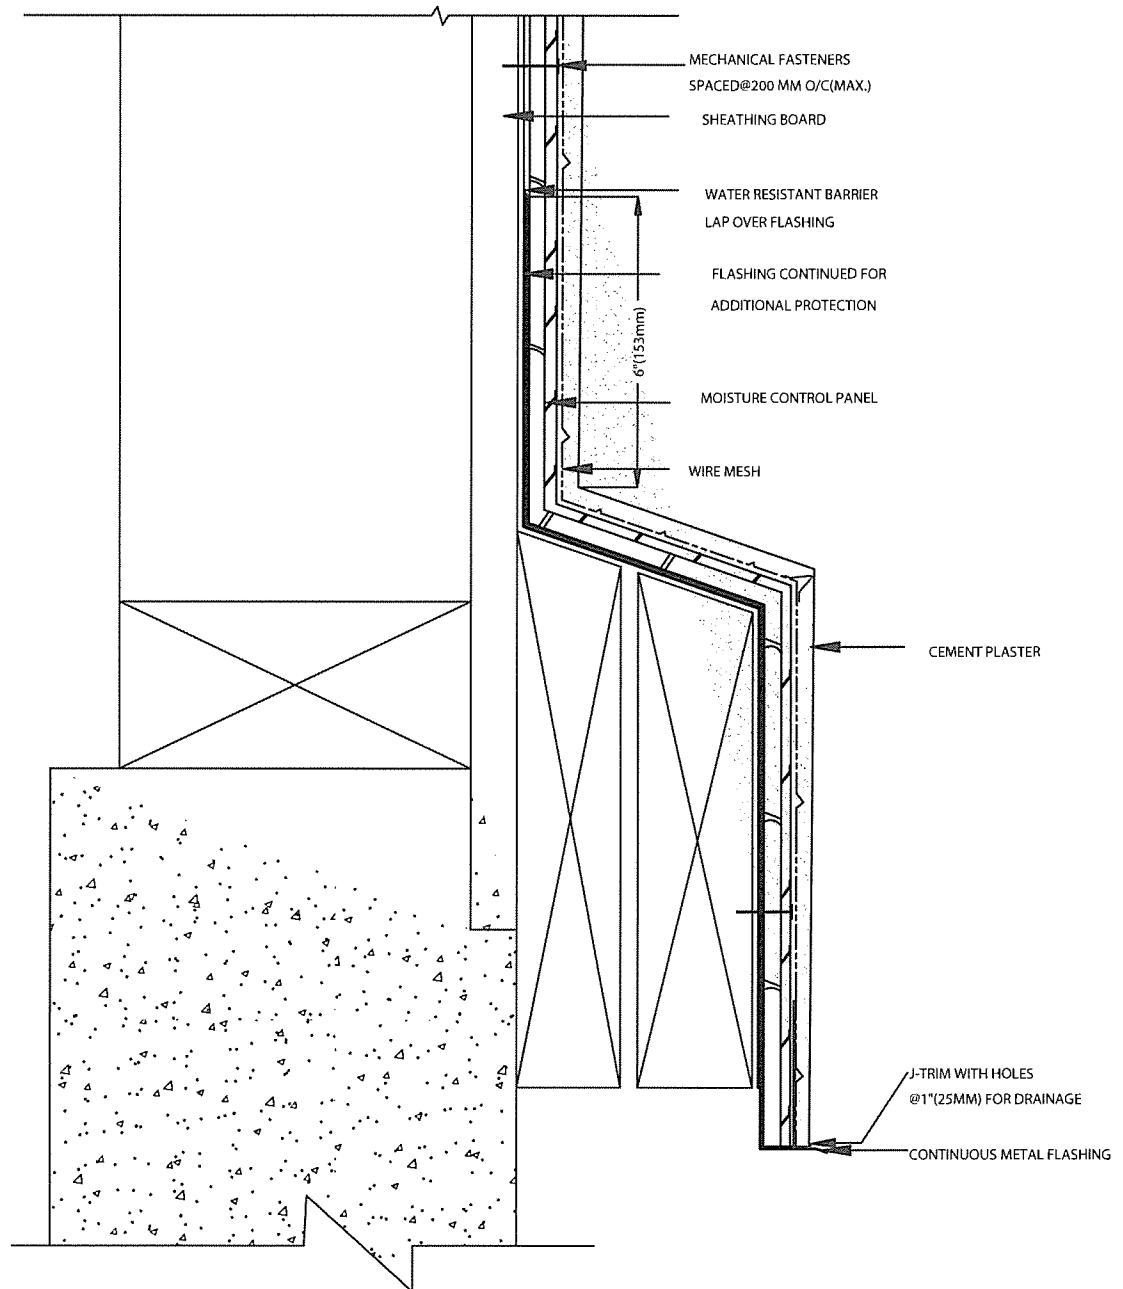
TERMINATION AT SLAB/SIDEWALK
